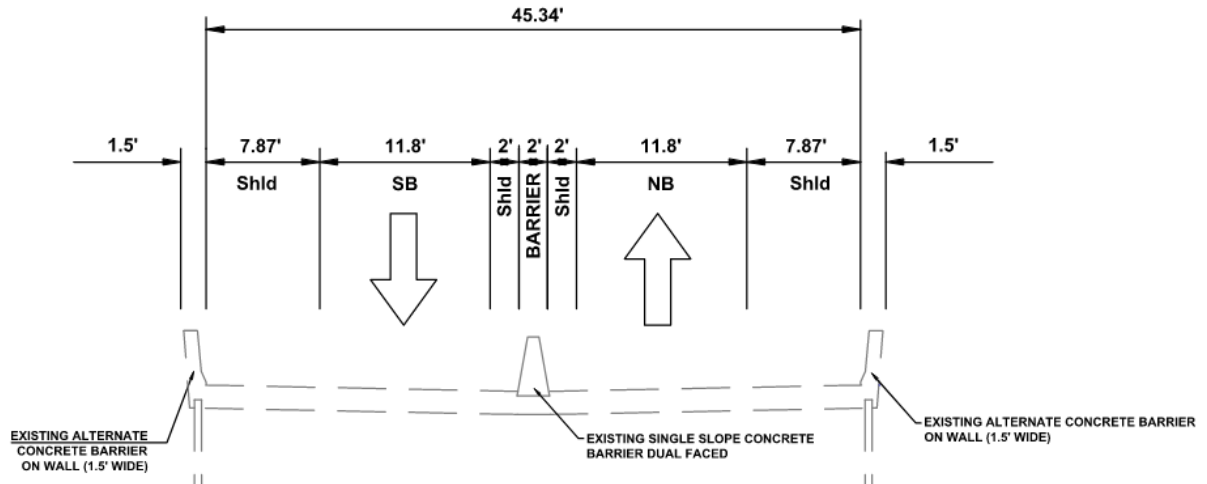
Lane arrangement of the existing NE 6th St. direct access ramp.
